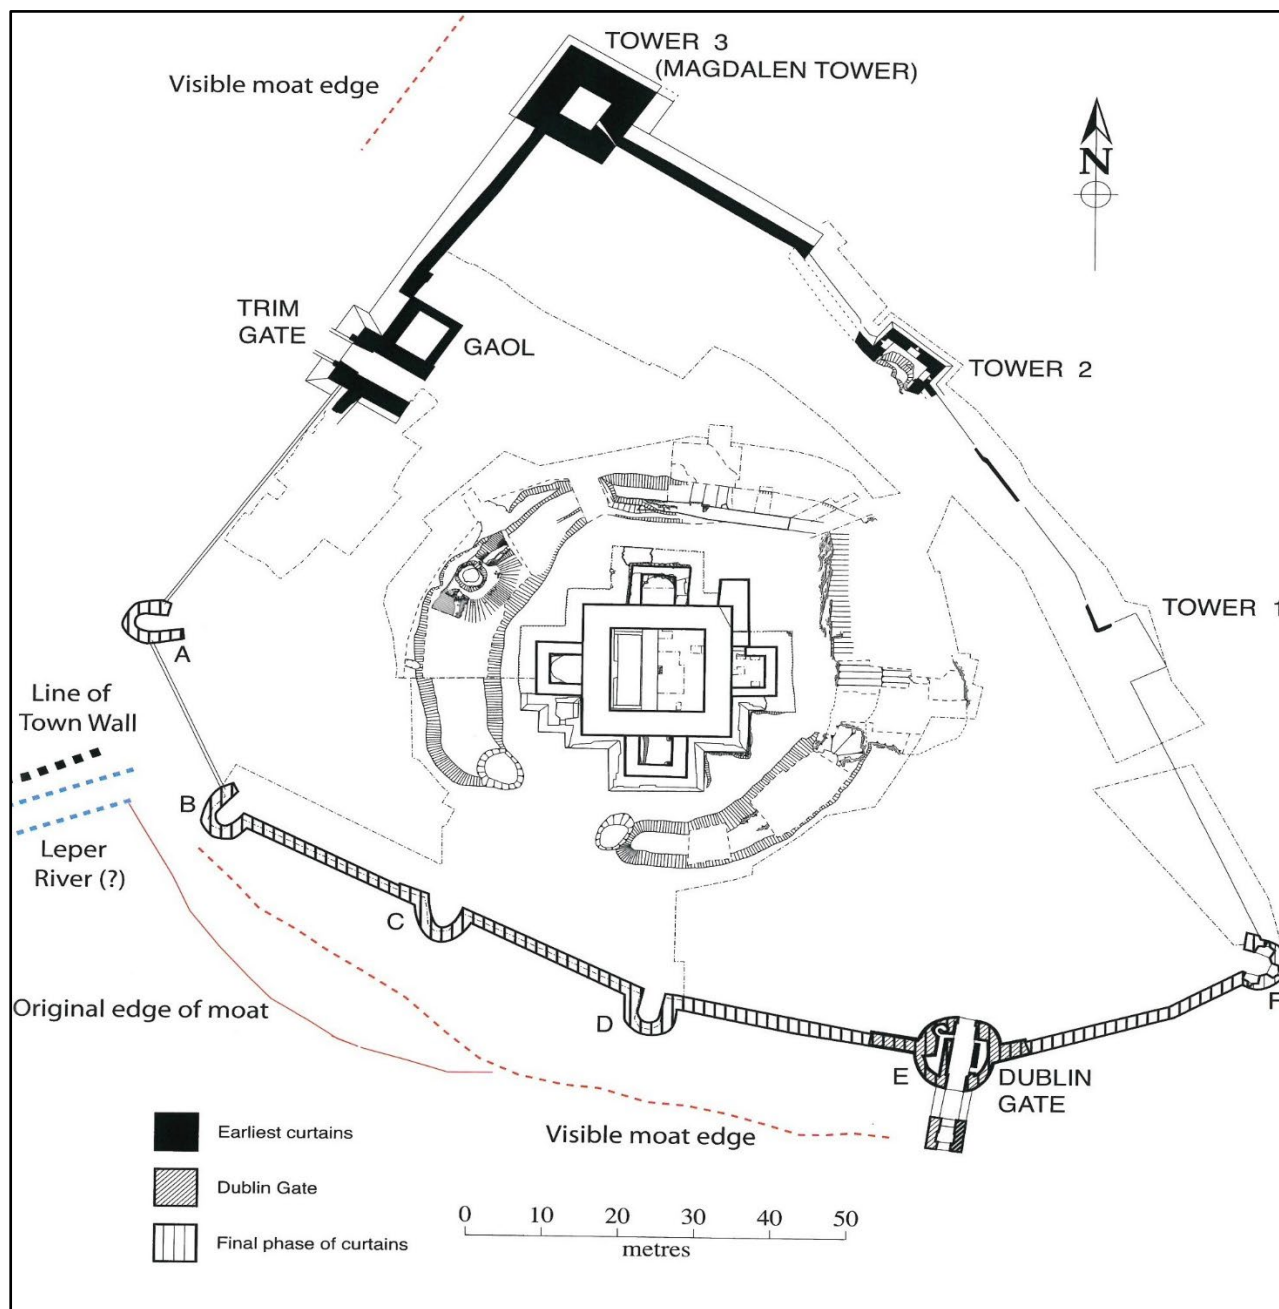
Layout of castle and bawn showing extant curtain walls and line of moat (after Hayden 2011)
